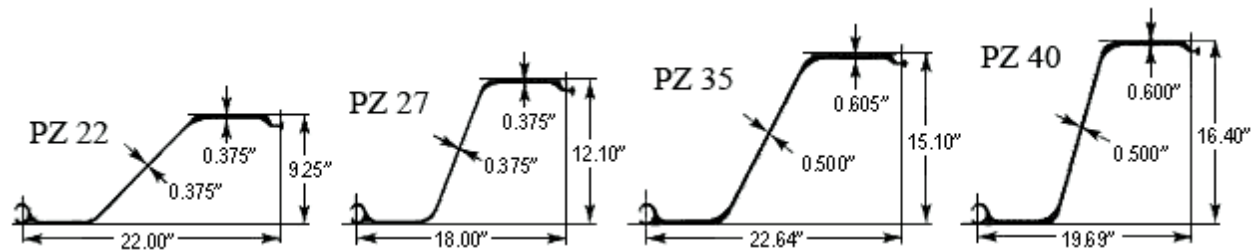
Cross Sections of Various Heavy Duty PZ Sheet Piles
